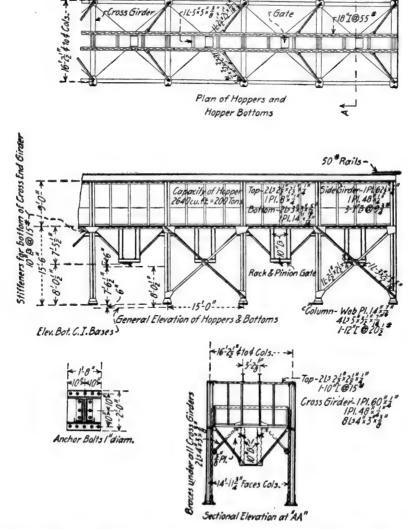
HOPPER BIN CANANEA CONSOLIDATED COPPER CO., CANANEA, MEXICO.
